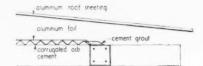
An insulated roof: aluminium roof sheeting, air space, aluminium foil, corrugated asbestos ceiling.
